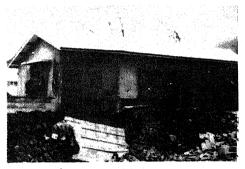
Damage of wooden house with reinforced concrete block wall (Iruma)
